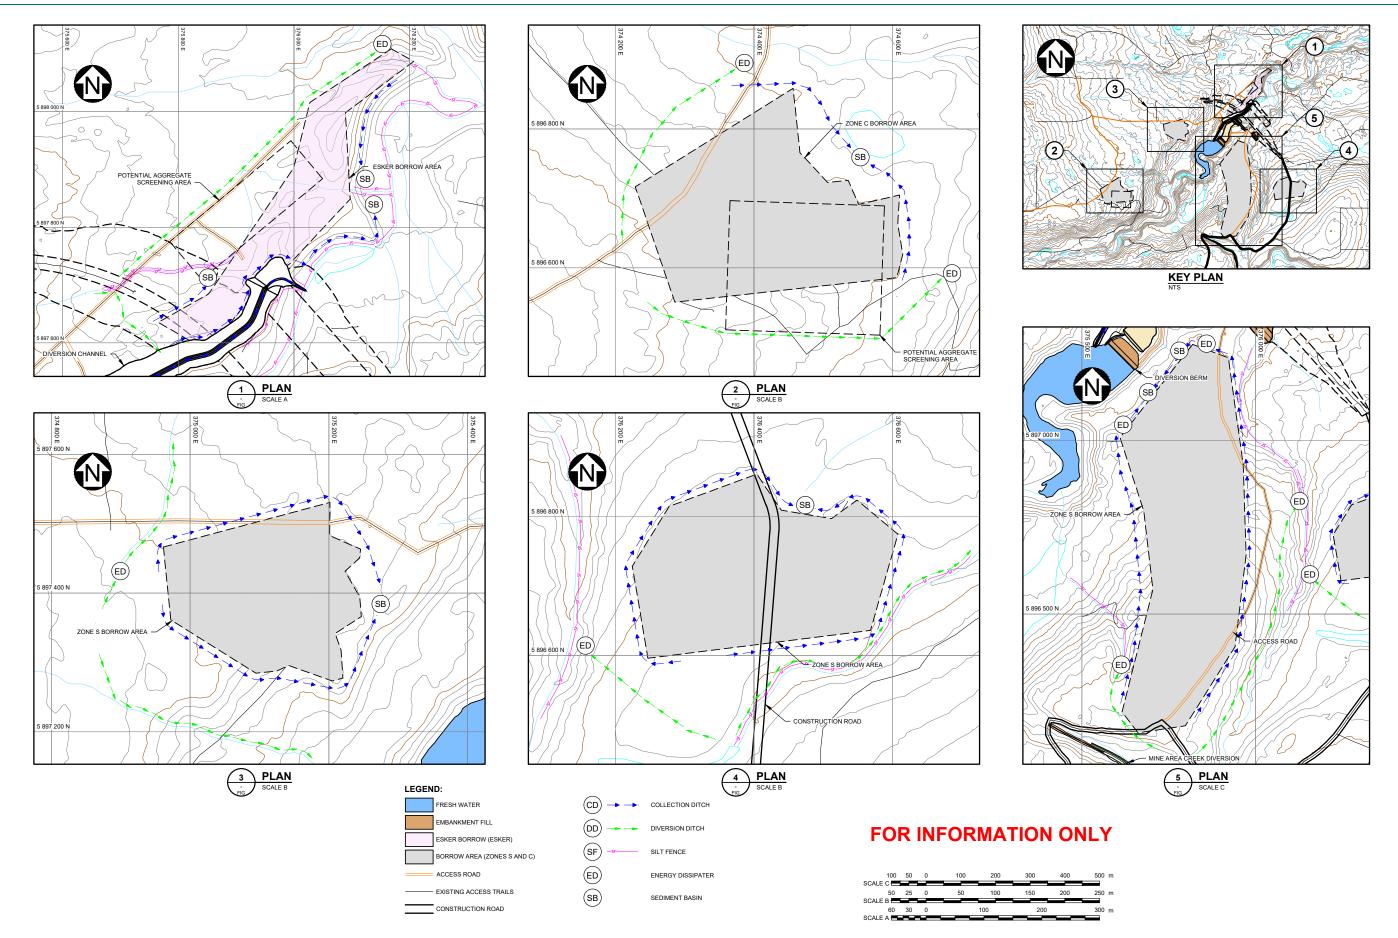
Site Borrow Areas General Arrangement – Erosion and Sediment Control Plan
